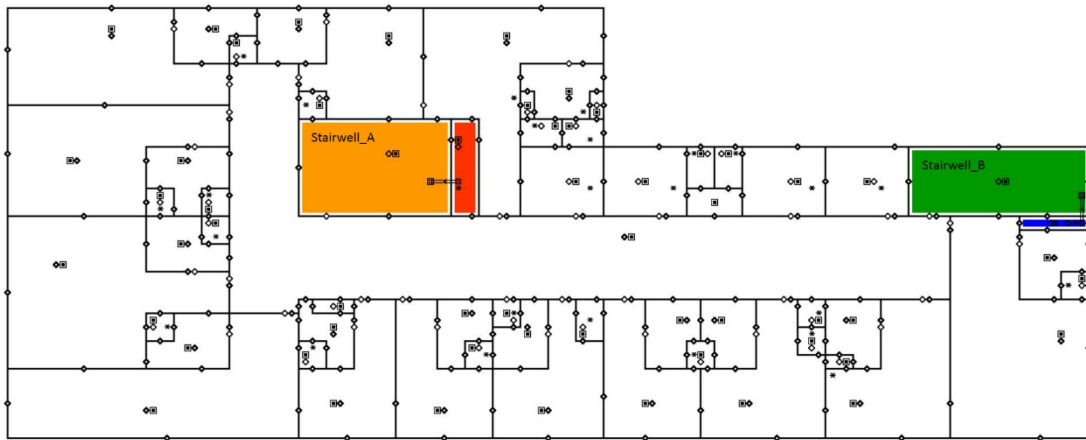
CONTAM model 7th through 17th floors showing location of stairwells and duct shafts.
